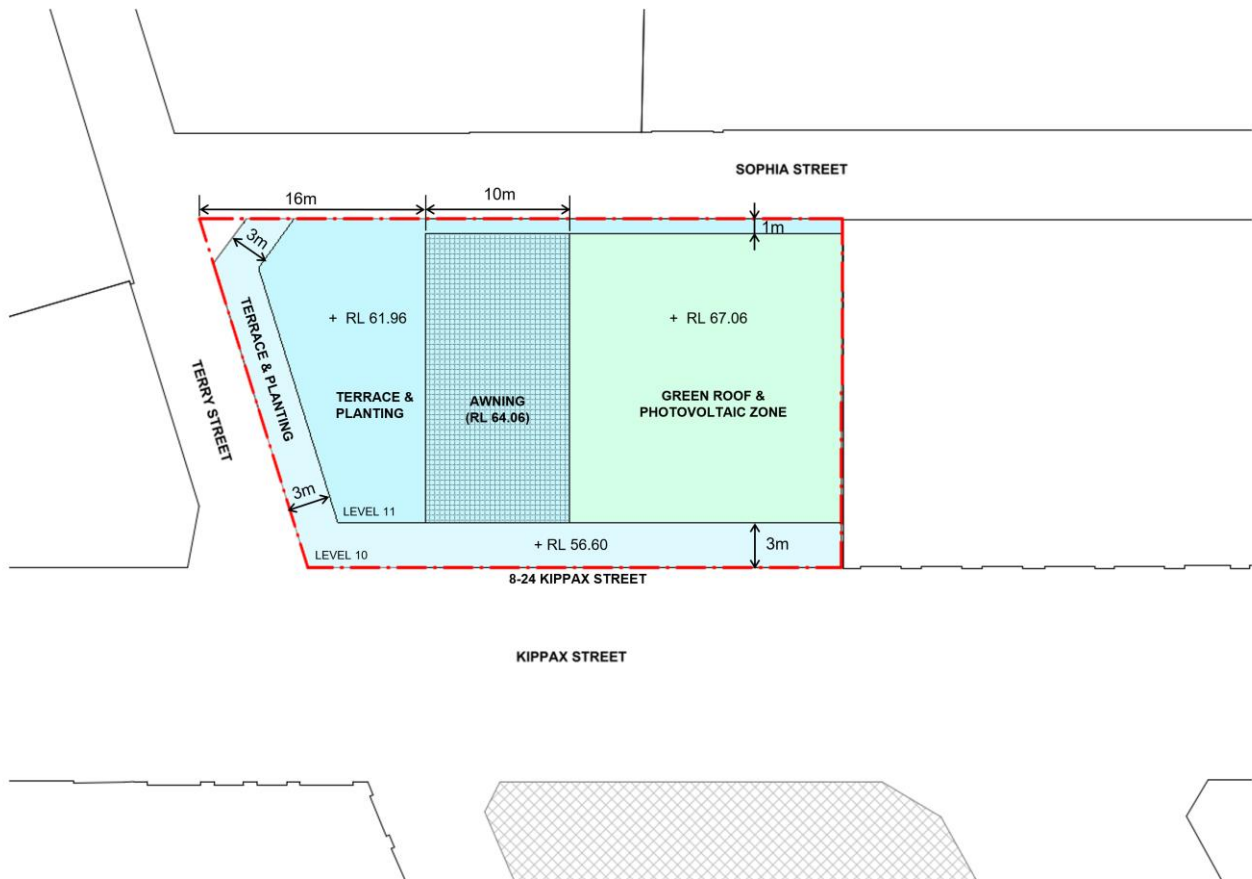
xx 8-24 Kippax Street, Surry Hills – envelope setbacks
